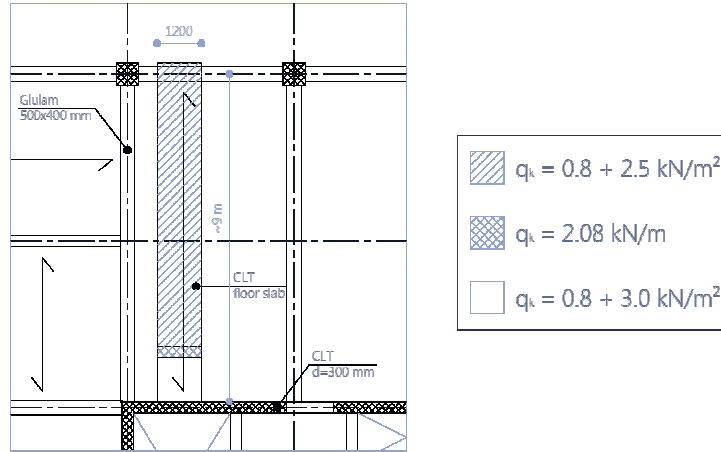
; Typical floor cassette loaded by permanent- and variable actions on office floor
